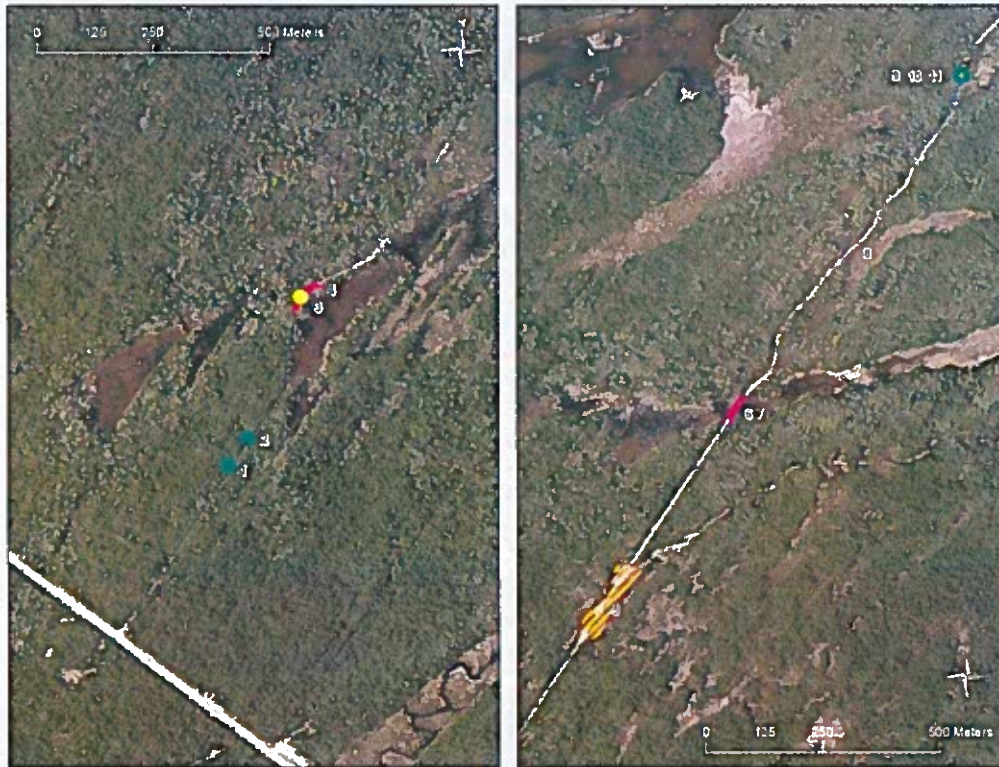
Identifies key points on Emmett Lake Road where additional road work beyond brushing and gravelling is required, as well as area where vehicle access is restricted.
